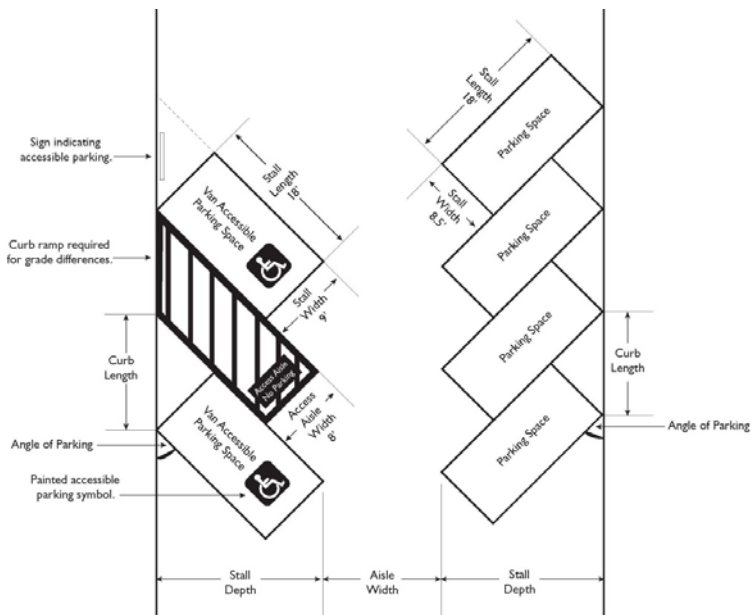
A.1: PARKING SPACES DIMENSIONS AND PARKING AREA DESIGN
